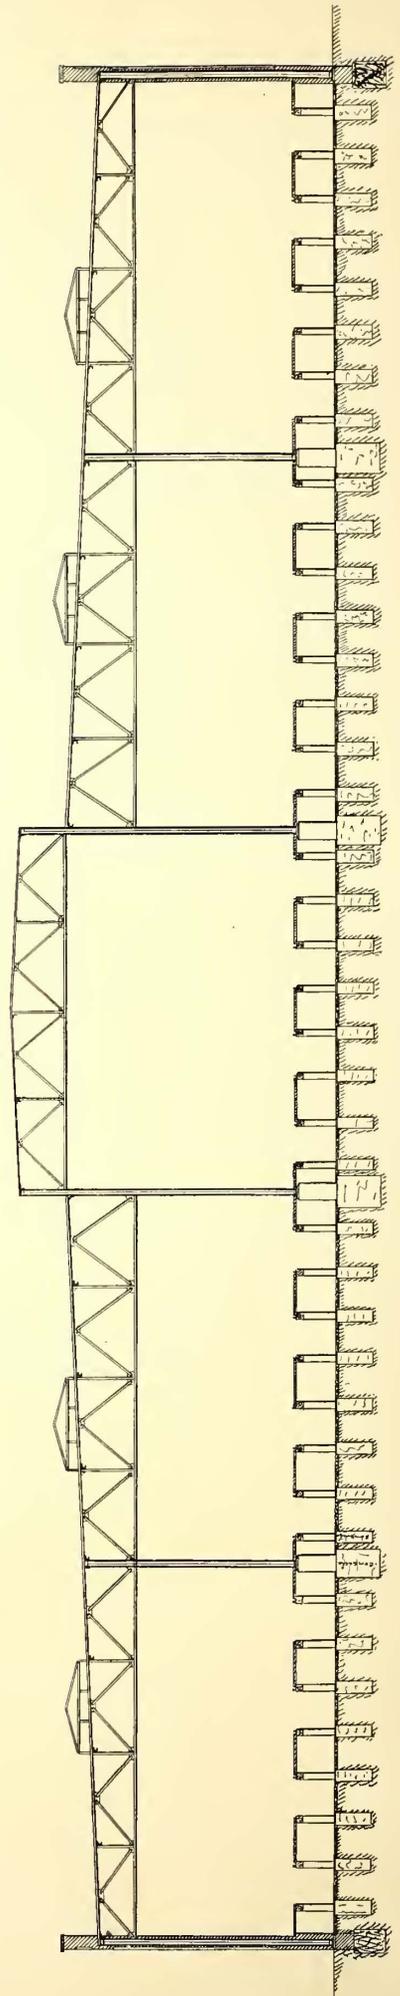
SECTION OF CAR HOUSE ON BROOKS STREET.
